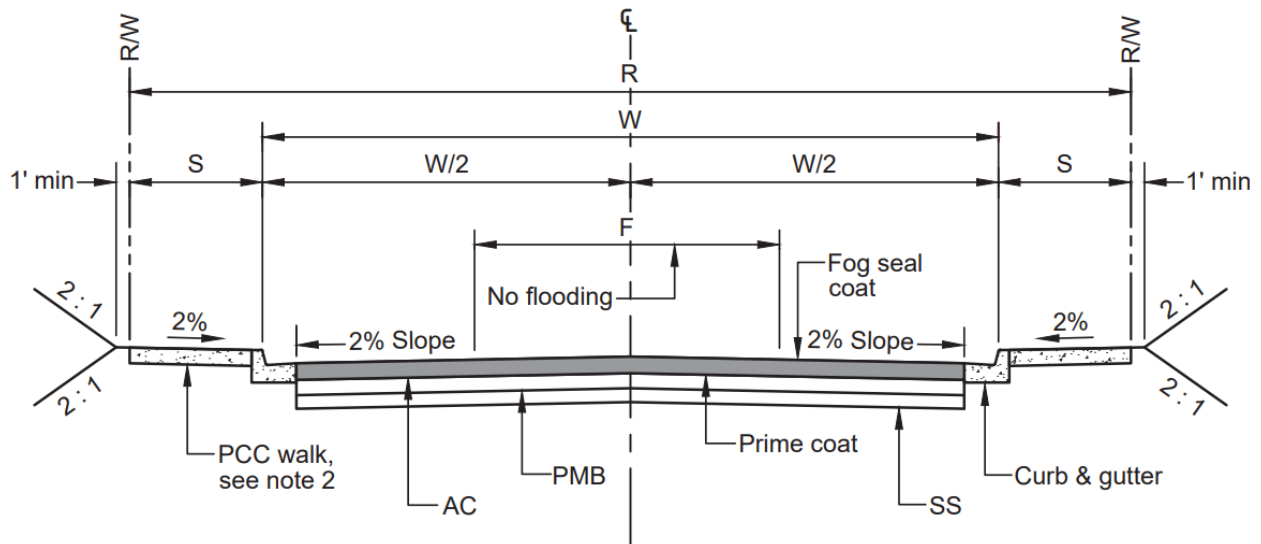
Plate B-3 cross section. R – Right of way width; W - Pavement width; F- Flooding free width.
